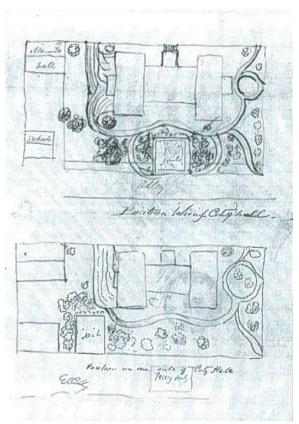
, Fredericksburg Courthouse, sketch plans for alternate site plan, James Renwick Jr., 1851. Courtesy Bobbi Kerr.
